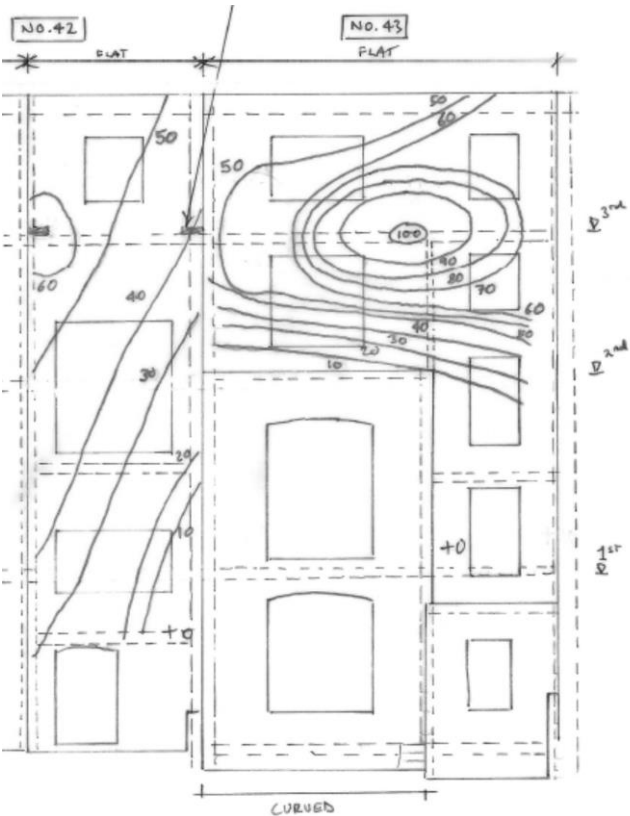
Rear elevations of Houses 42-43, showing movements of walls
